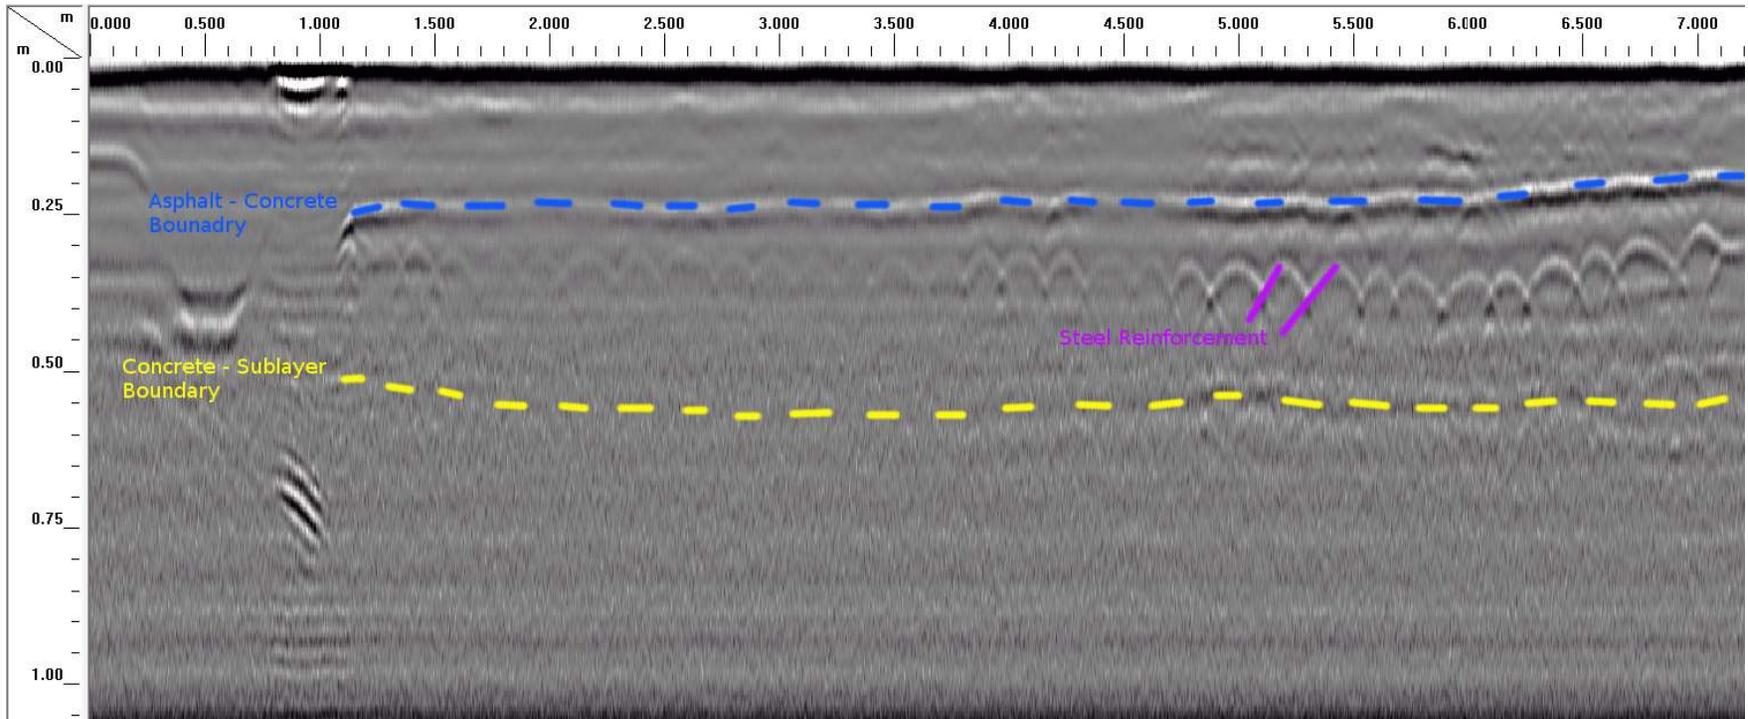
Example of steel reinforcement and subsurface boundaries from the Northern section. Evenly spaced steel reinforcement; 15cm spacing.
